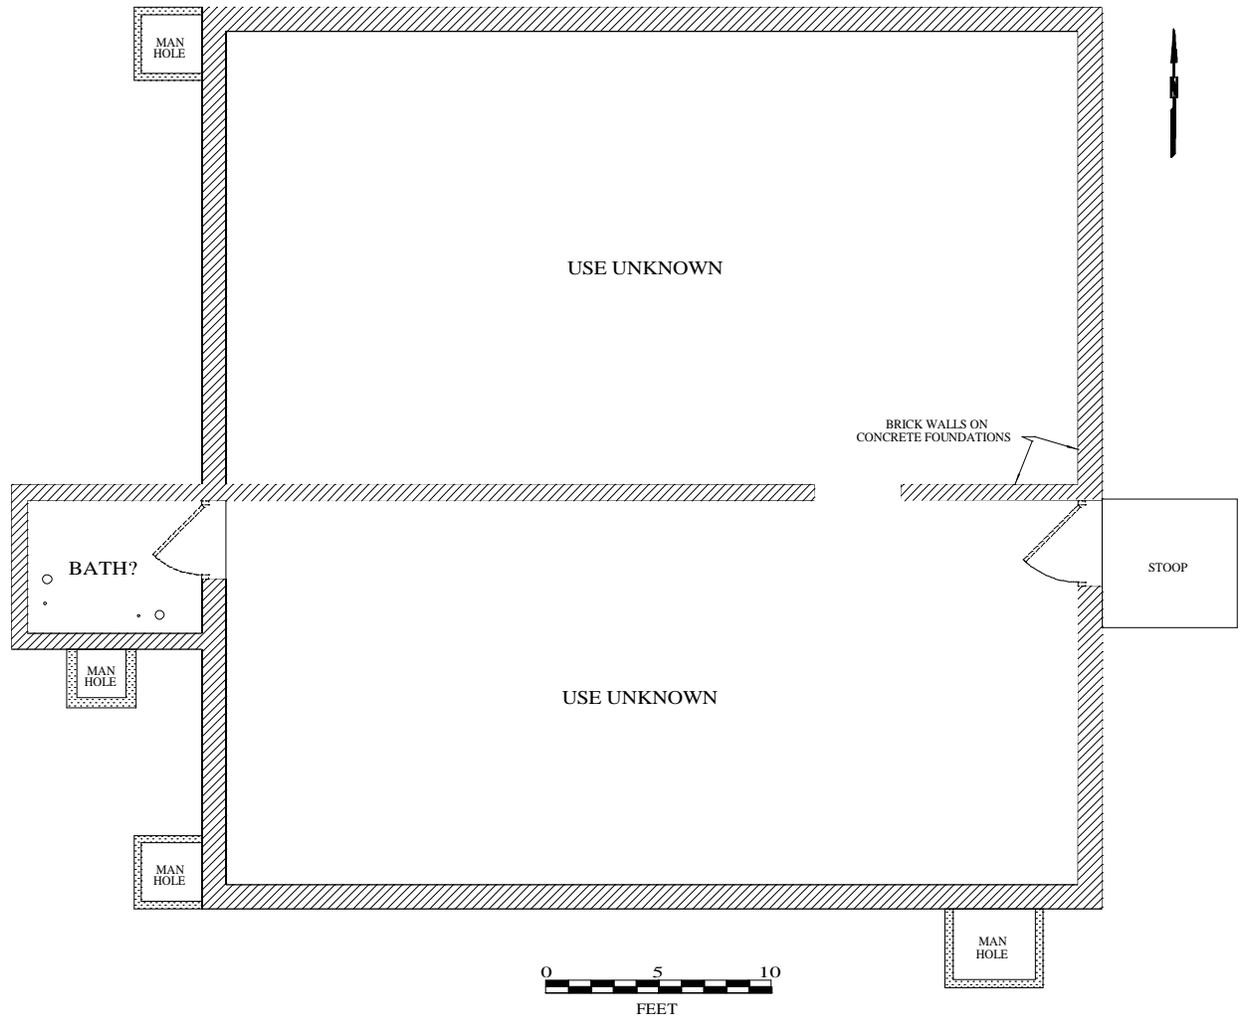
Floor plan of Feature 9, a large brick building located on the western edge of the site. The function of this building has not been determined (FRR 2002).
